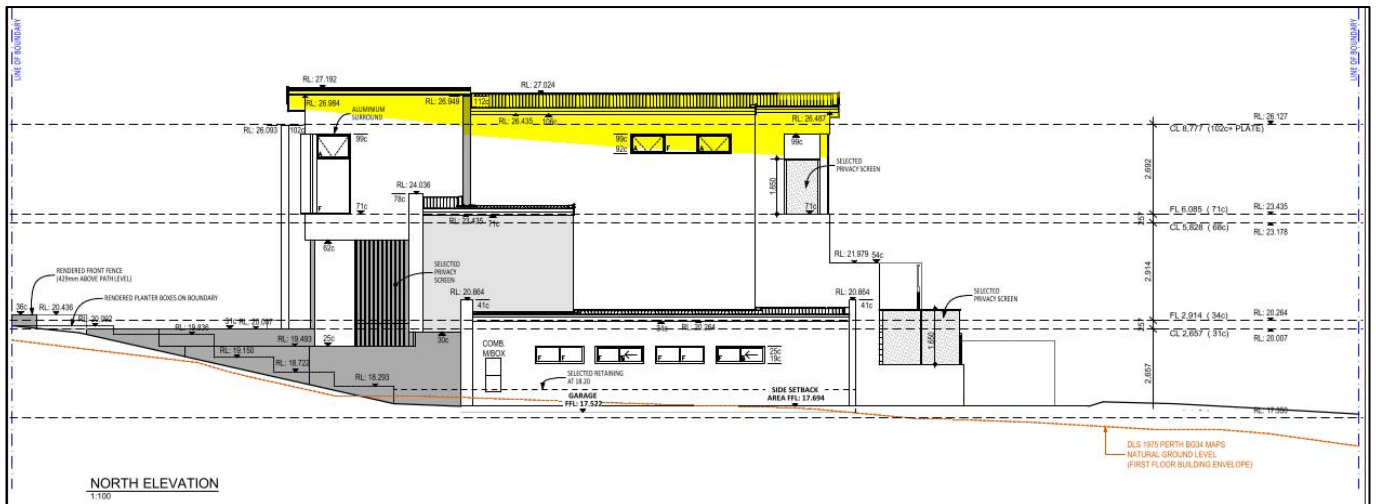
Diagram showing the over height portions of wall and roof from the northern elevation (highlighted yellow).
